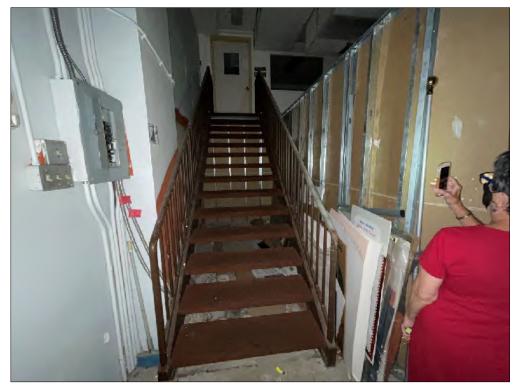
1159 Fort Street Mall ground level and mezzanine level. View facing south.¹²
